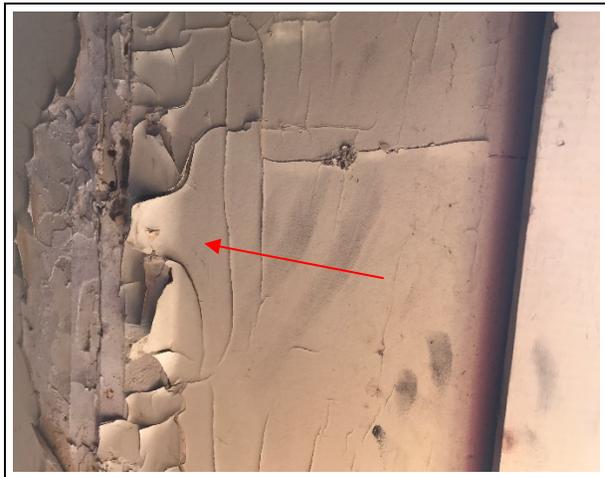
Building 2 – lead-containing (1,200 ppm) cream coloured paint located on the drywall walls in room 2
